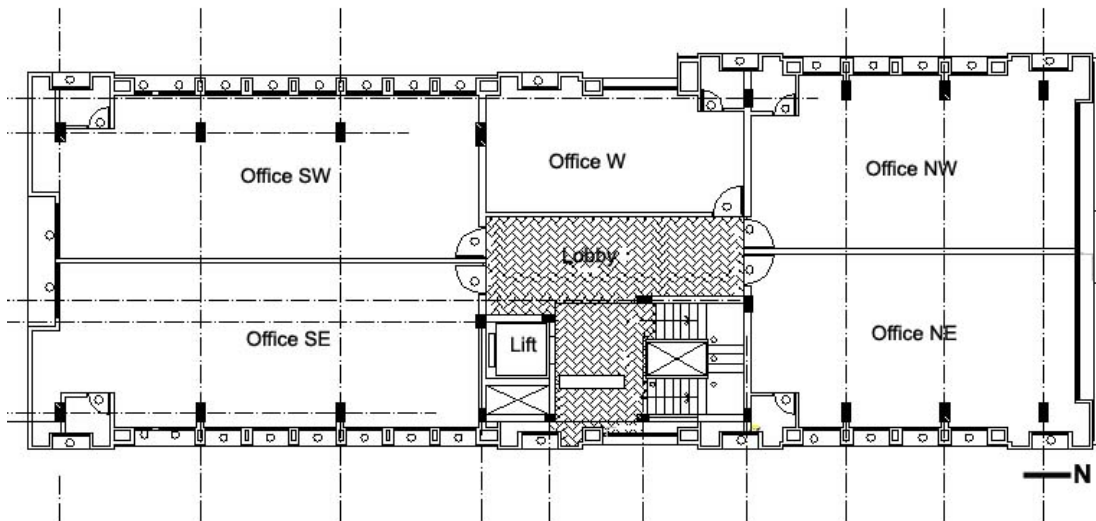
First Floor Plan of Mahavir Commercial Complex
